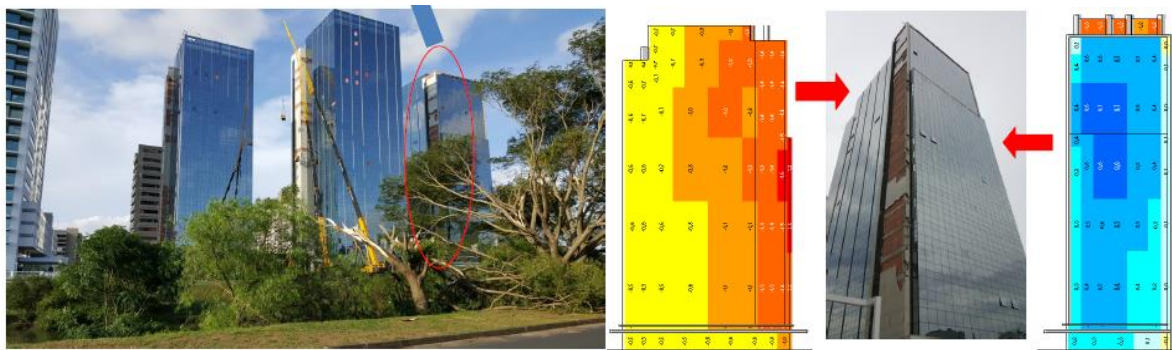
Full-scale damage caused by downburst and mean pressure coefficient diagrams of building façades from boundary layer wind tunnel tests (suction = red, yellow; pressure = blue) for Tower C
